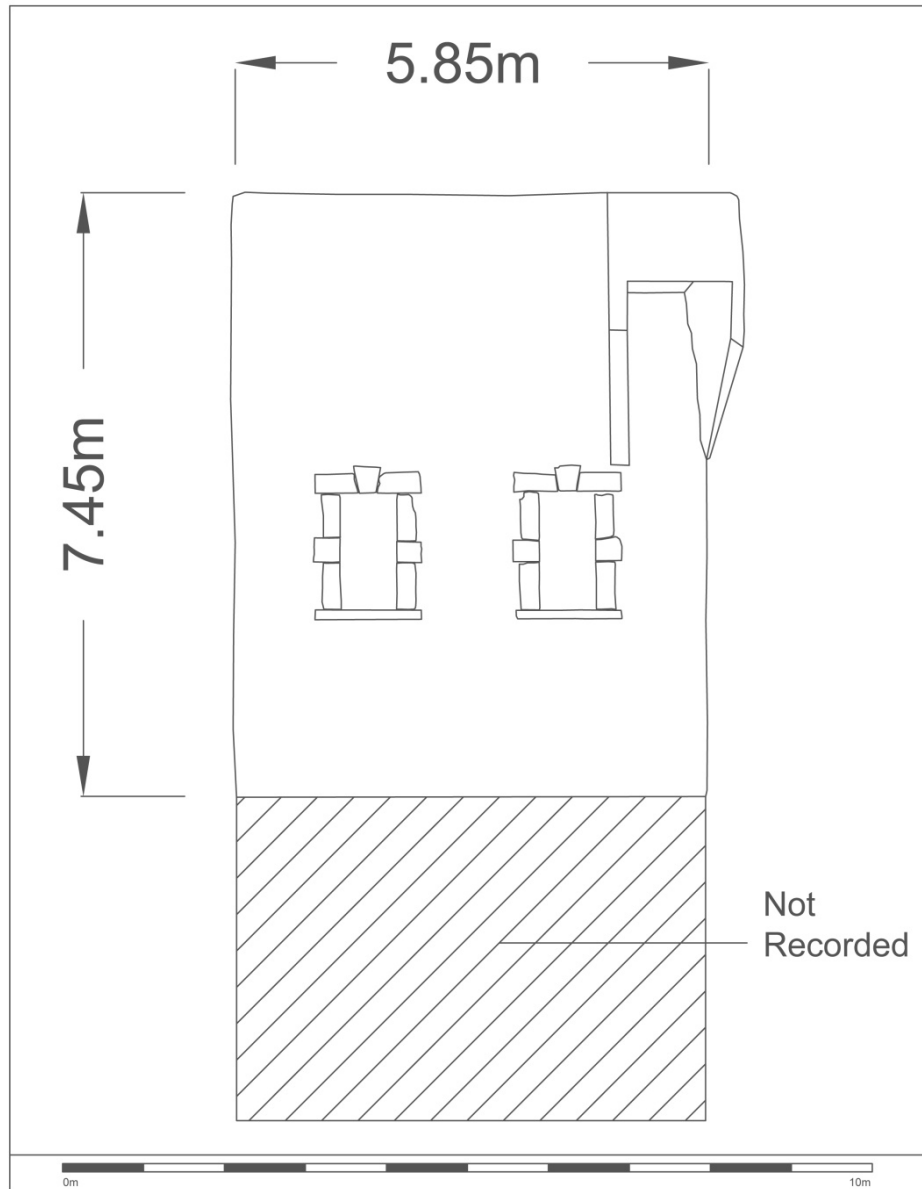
External elevation of the south-east wall of the signal tower at Inisheer Signal Station.
